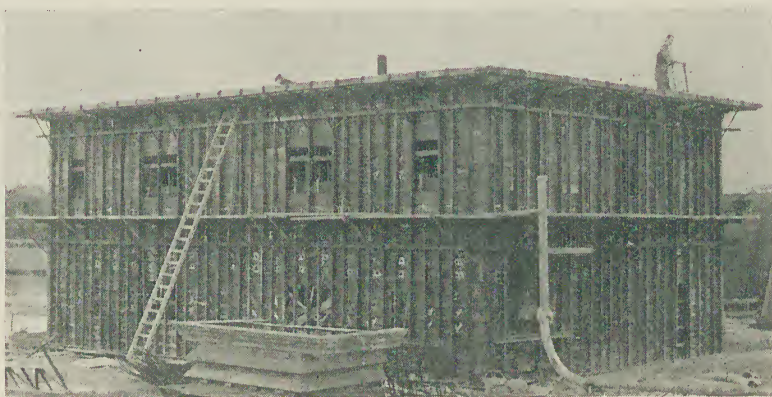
STEEL SHUTTERING FOR LOWER AND UPPER STORIES.
